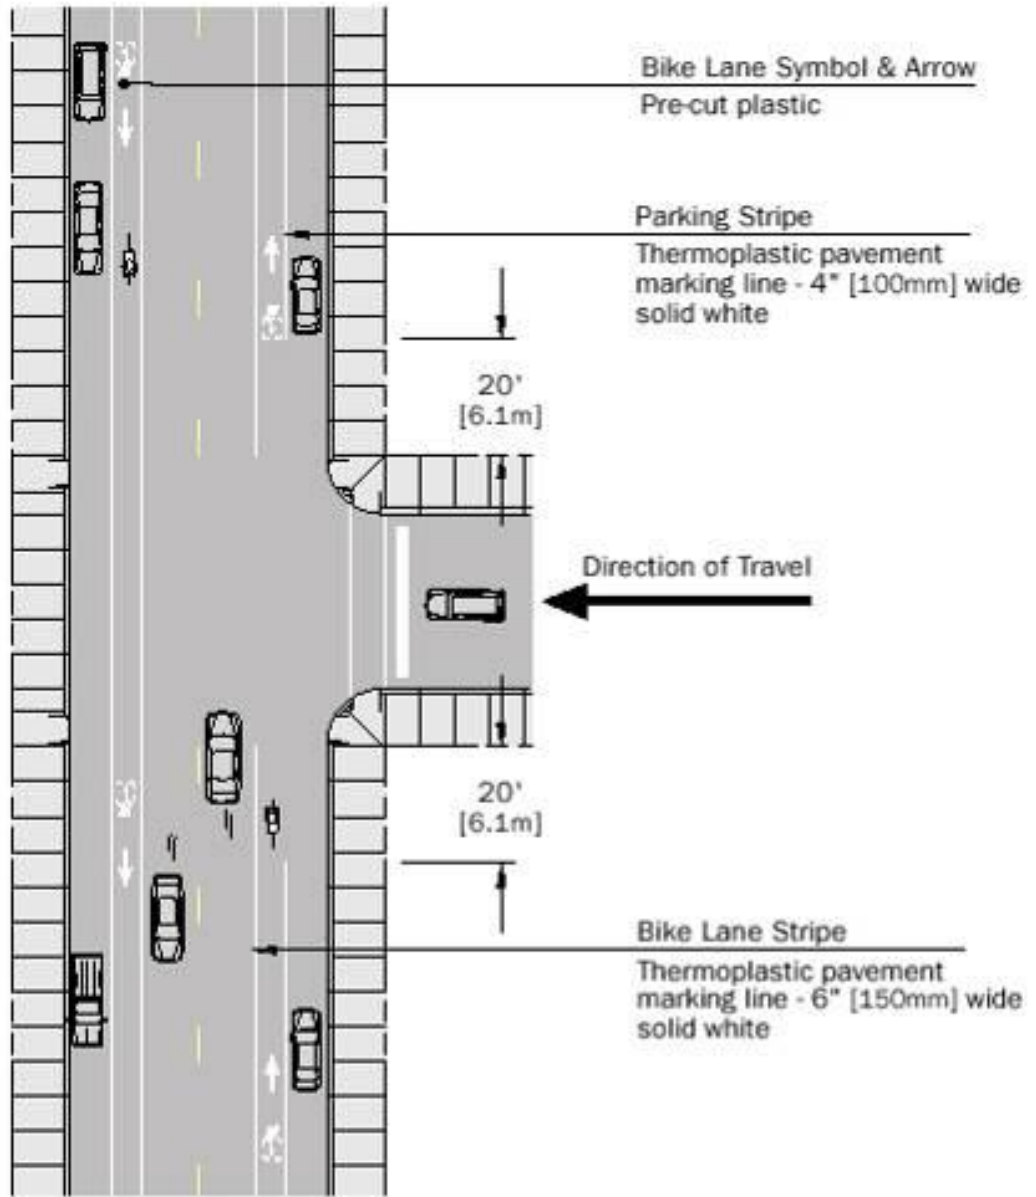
Striping for bike lane with parking at T-intersection with one-way local street
